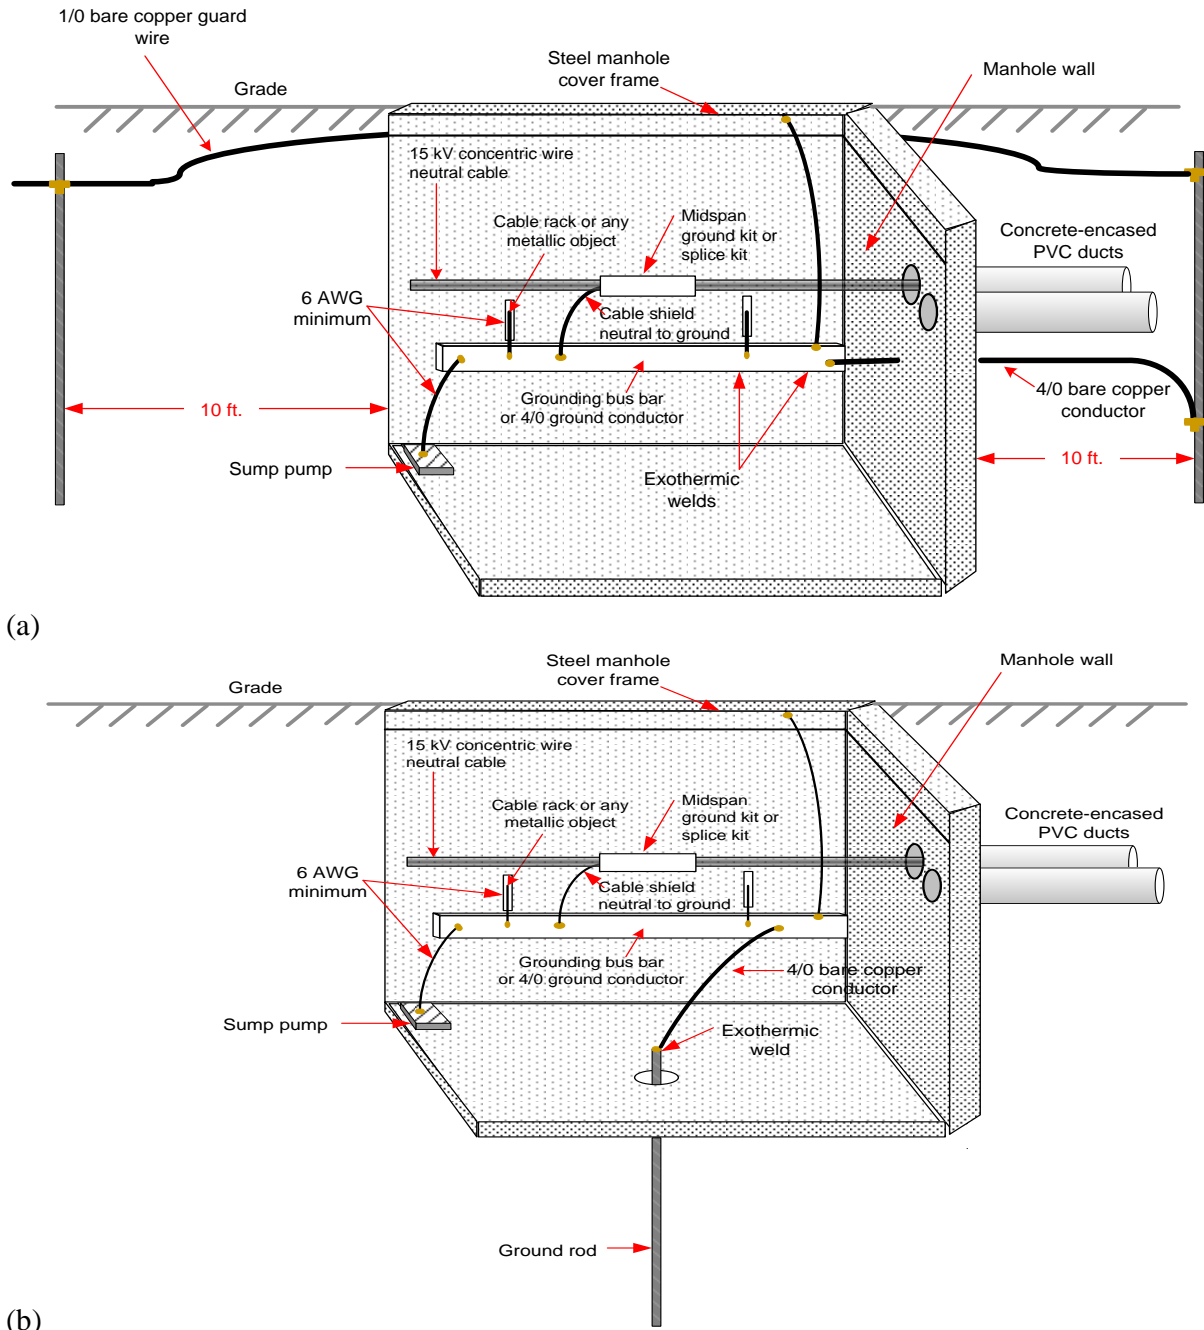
Grounding and guard wire installation detail for (a) manhole having a guard wire, and (b) manhole lacking a guard wire.
